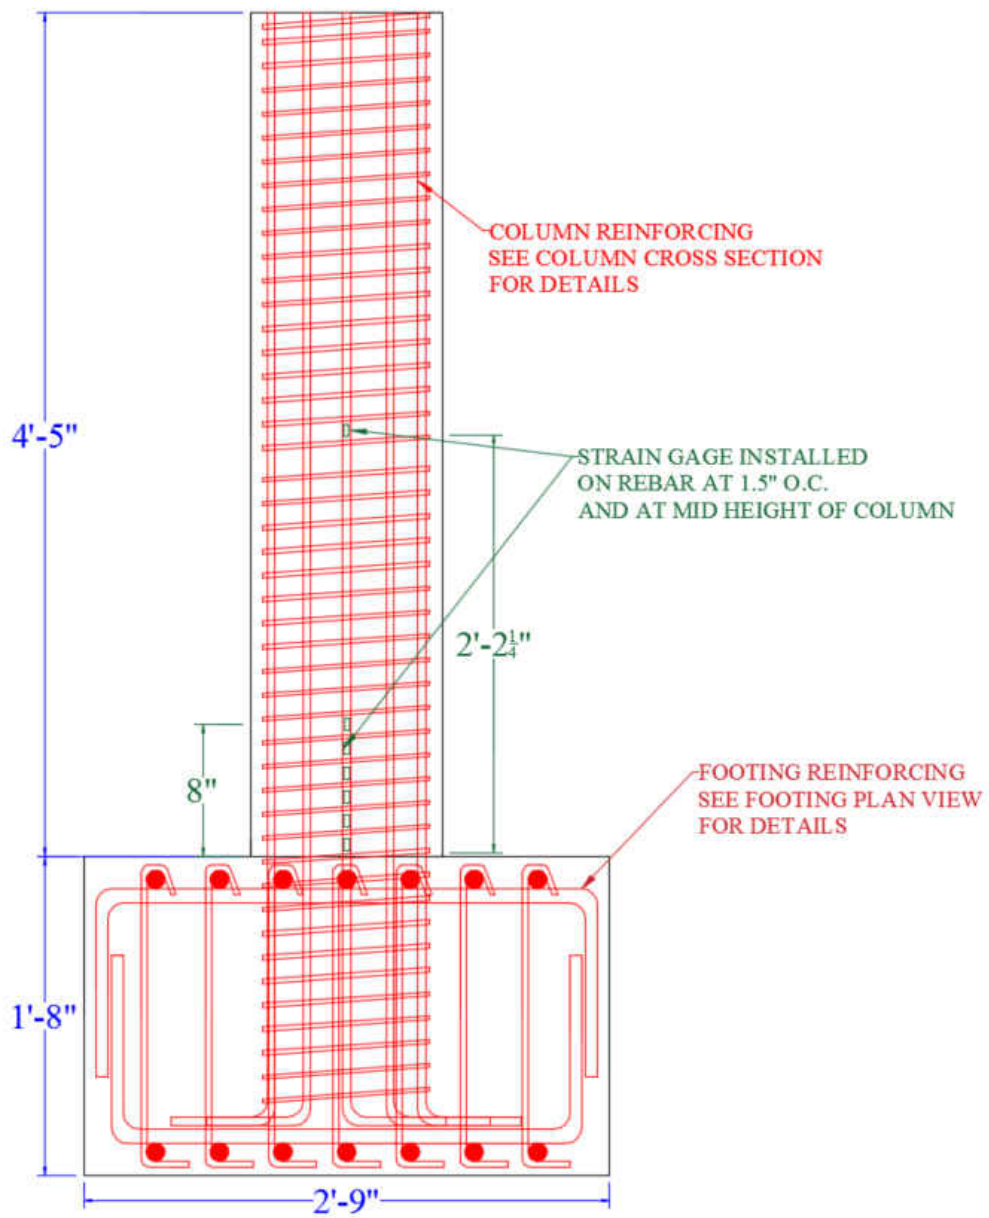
Column Specimen Reinforcement and Strain Gage instrumentation
